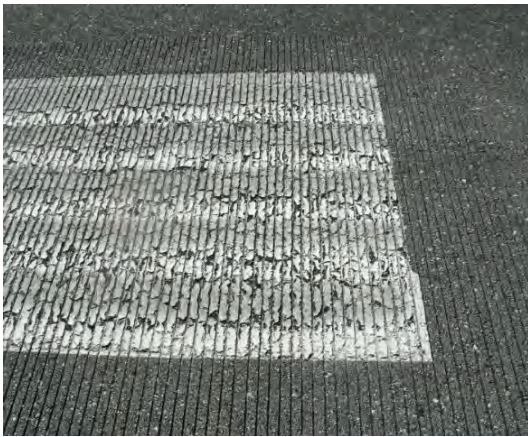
A PRE-EXISTING CONDITION OF POOR ASPHALT PAVEMENT.
